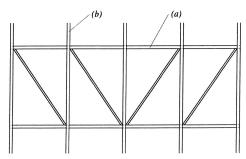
N-truss. (a) Braced beam, (b) purlin.
